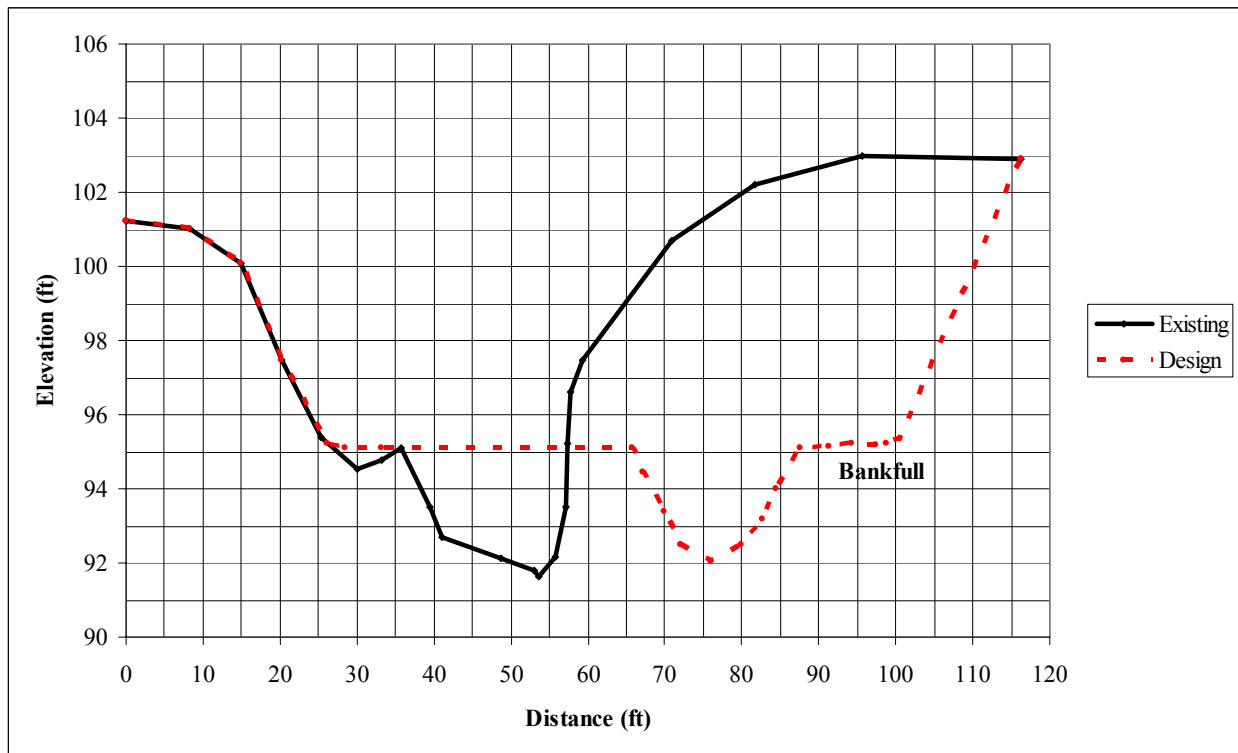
Reach 1 at Cross Section G Facing Downstream.
